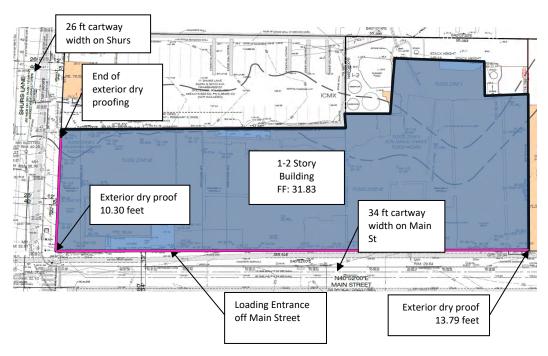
Scenario 1A: Maintain existing building footprint of approximately 44,000 square feet and building height of 1-2 stories. Alternative 1A would require a parking variance.
